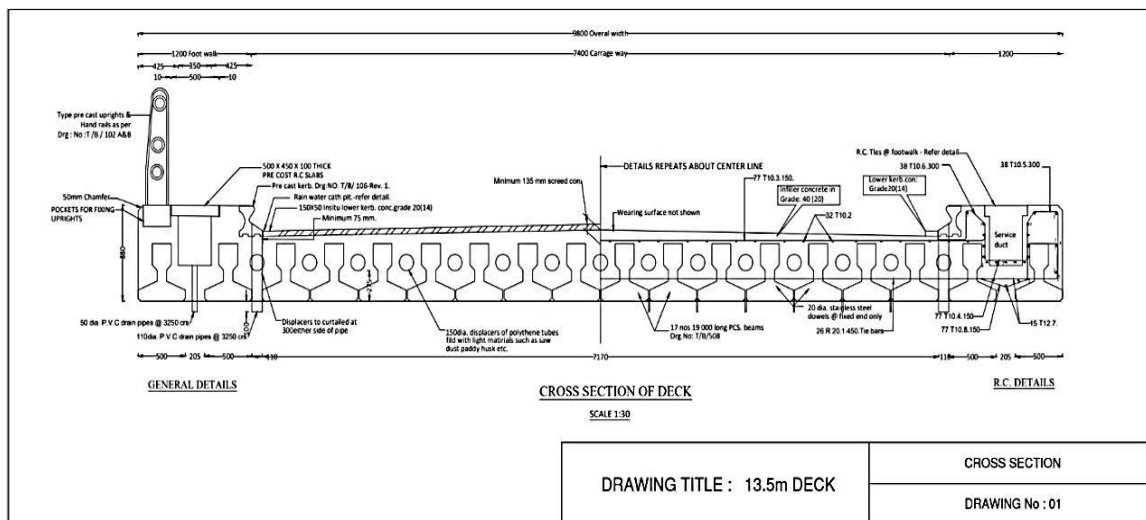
Two lane voided slab-deck 13.5m (smallest length) cross section
